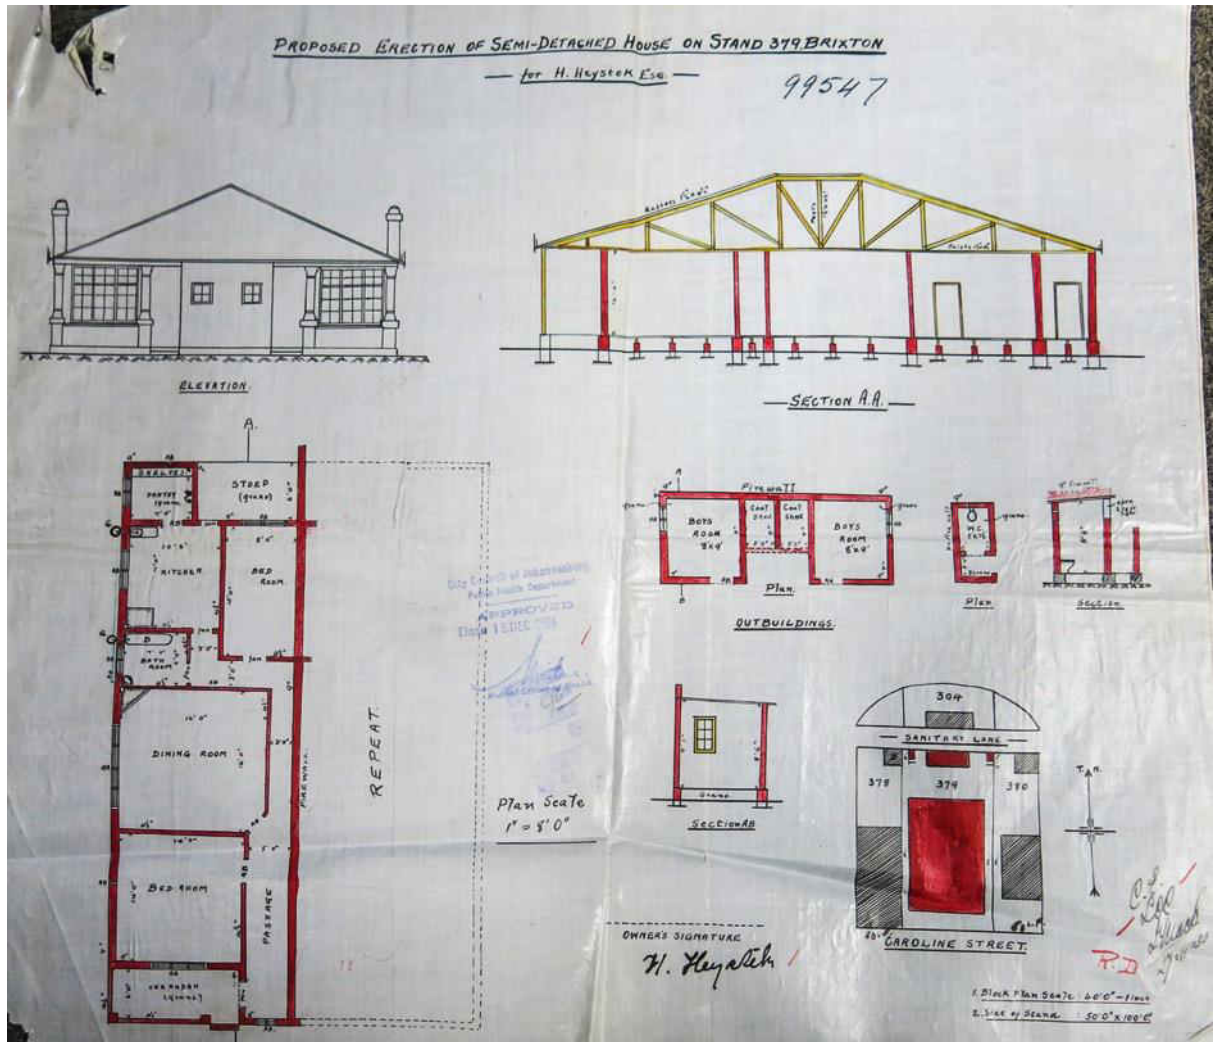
Proposed plan for semi-detached house on Stand 379 from 1930
